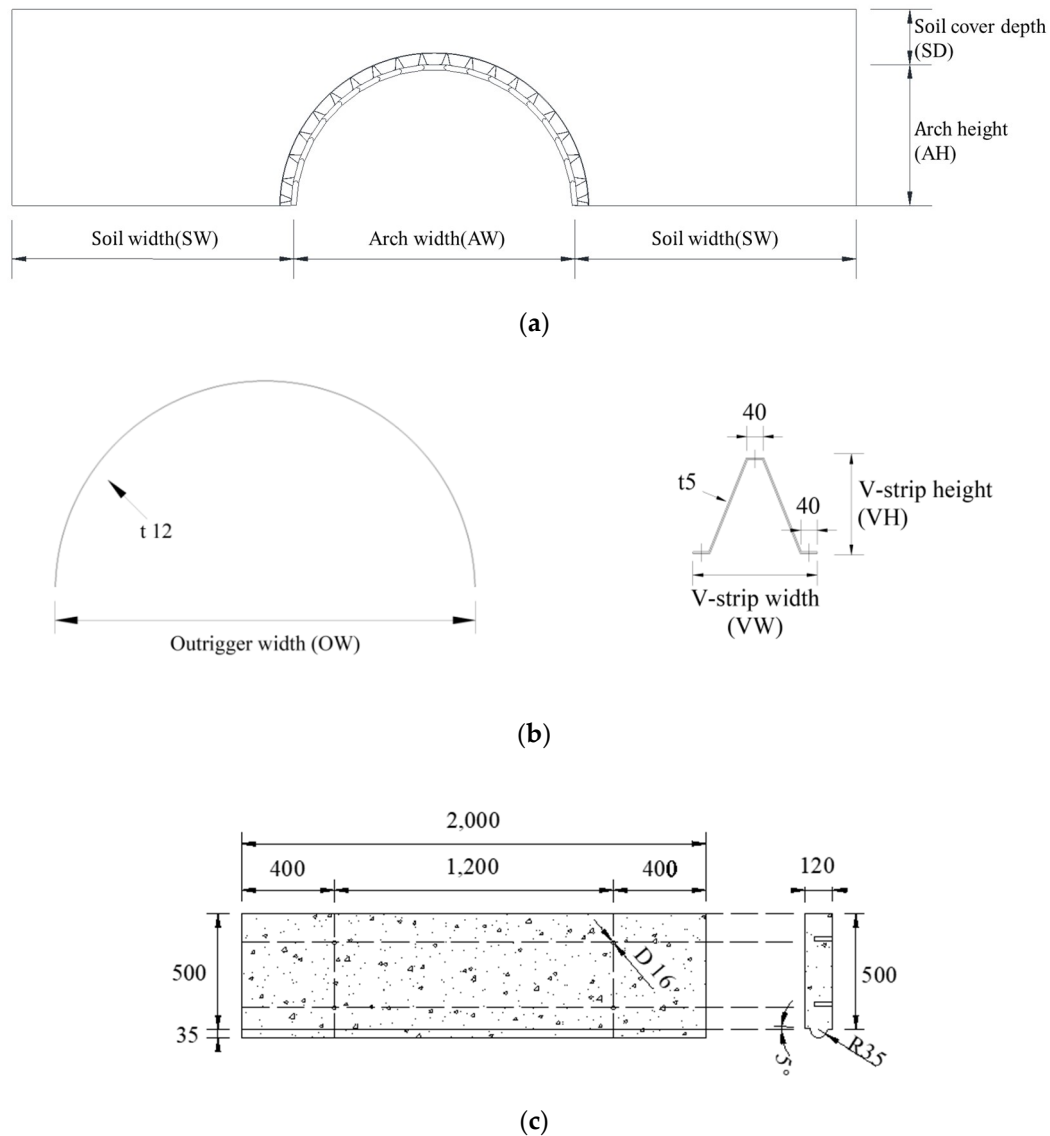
Specifications of target bridge for 3D structural analysis (units: mm): (a) precast, panel-segmented arch bridge with outriggers; (b) outrigger and V-strip specification; (c) precast panel specifications.
